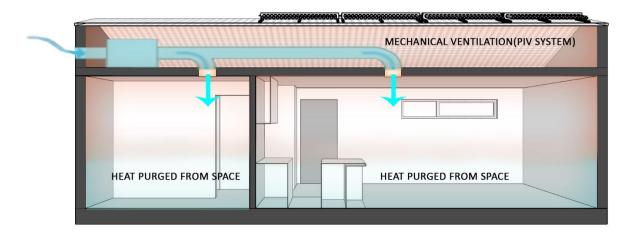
PIV Ventilation System Principle of The Timber Kit House Proposal
